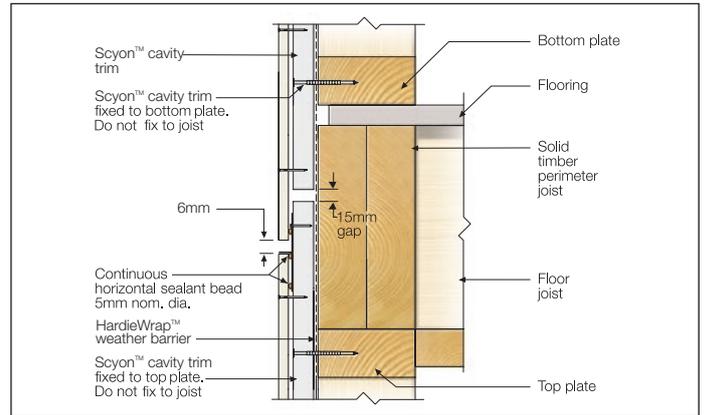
FLOOR LEVEL JUNCTION T-FLASHING OPTION
